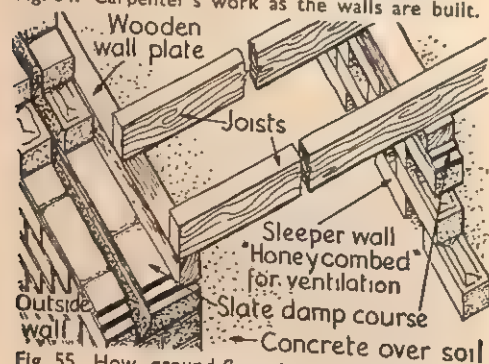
How ground-floor joists are supported. Why are the joists placed (1) on edge; (2) with their ends above the damp-course? What is the use of the sleeper wall?
